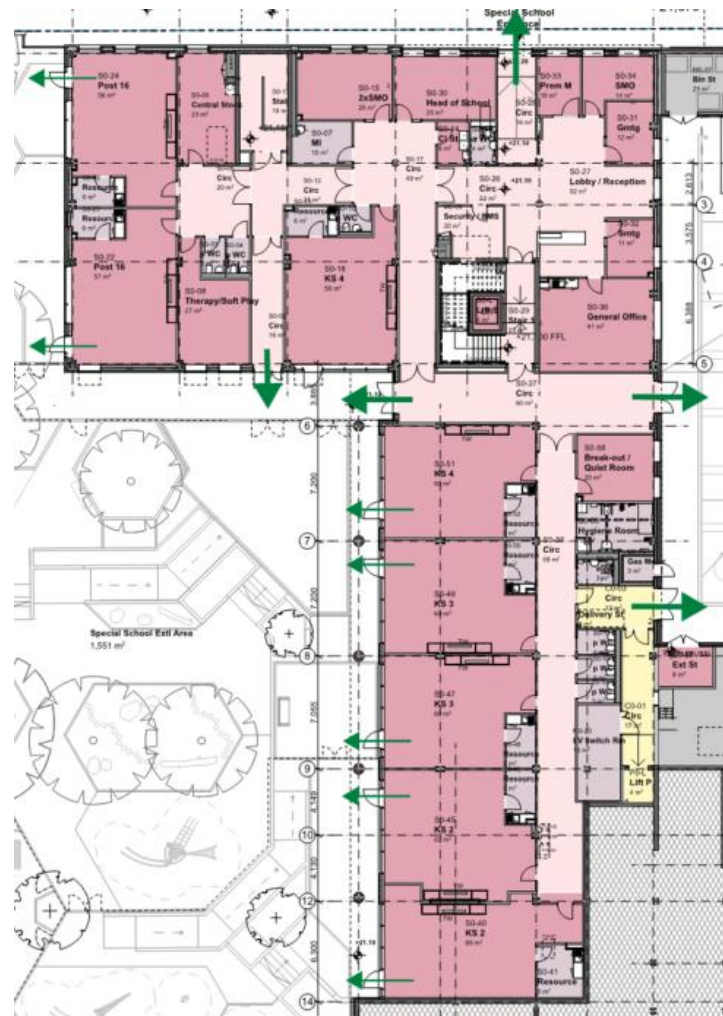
Storey exits at Lower Ground Floor of SEN school.
